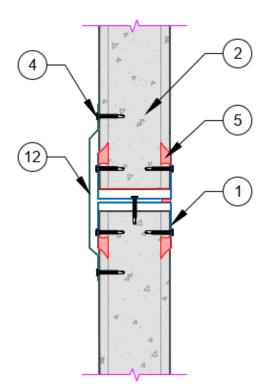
Back-to-back C-track connection in dual stack wall with metal flashing on unexposed side
